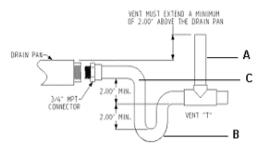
Typical condensate drain connection with A-Antisiphon Air Vent, B- Drain Trap, and C- Drain Line. Secondary drain not shown.
